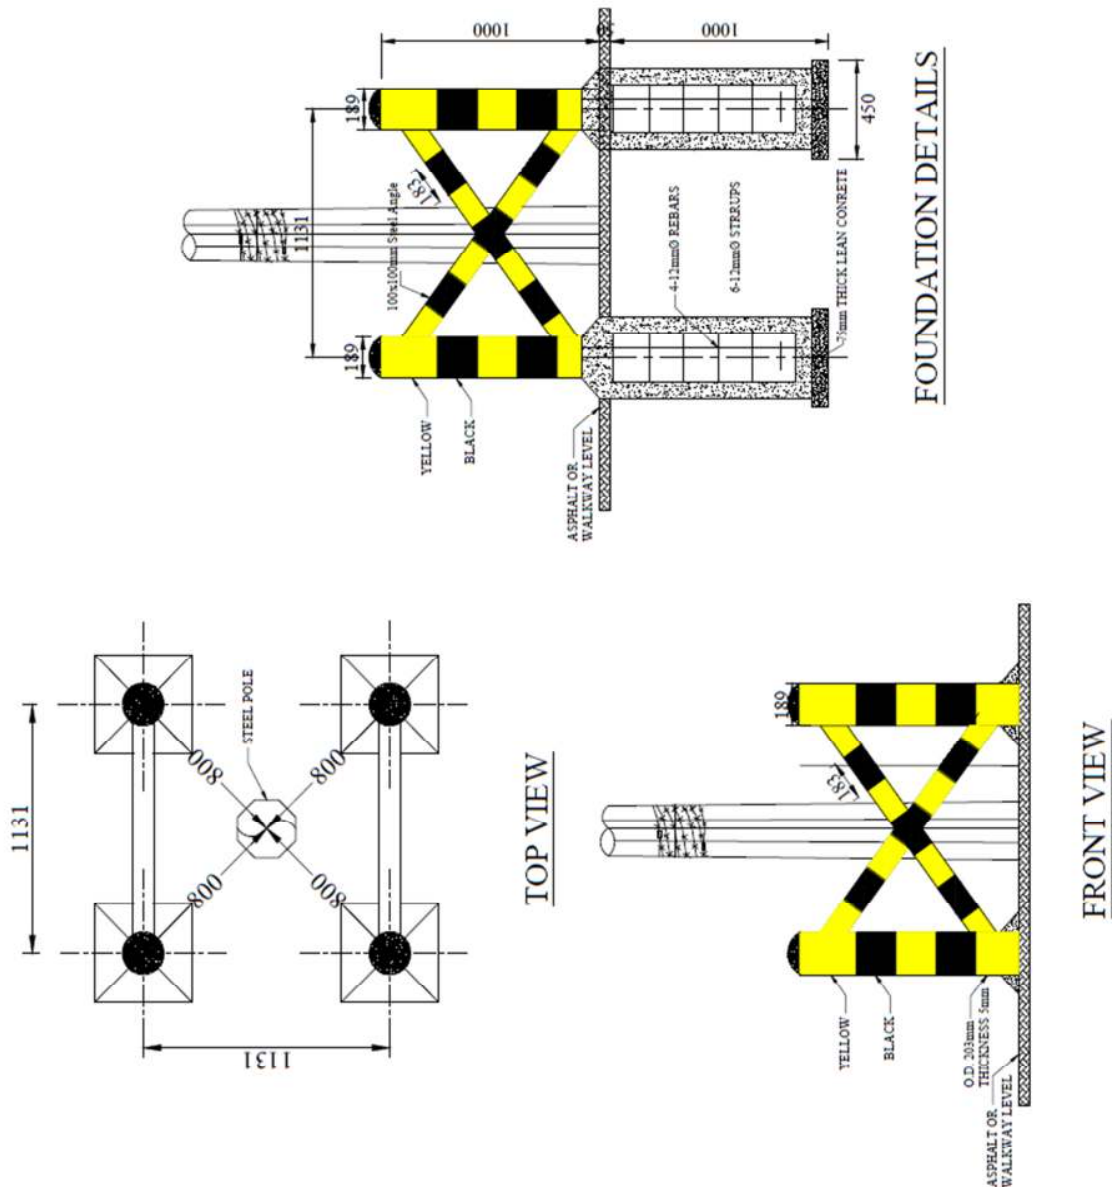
FIG: K - PROTECTIVE BARRIER FOR POLES HEAVY PROTECTION
